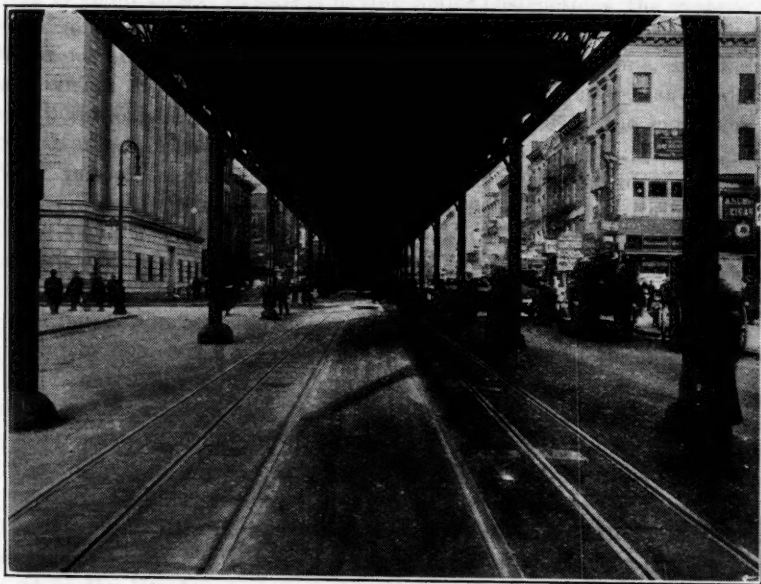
VIEW OF SIXTH AVENUE, NEW YORK, N. Y., LOOKING NORTH BETWEEN 35TH AND 36TH STREETS.
